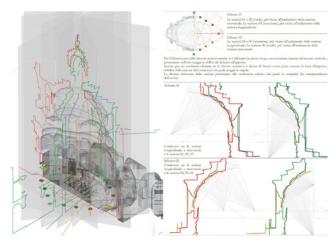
Laying plans of vertical sections analyzed. Image and drawings by the author.
